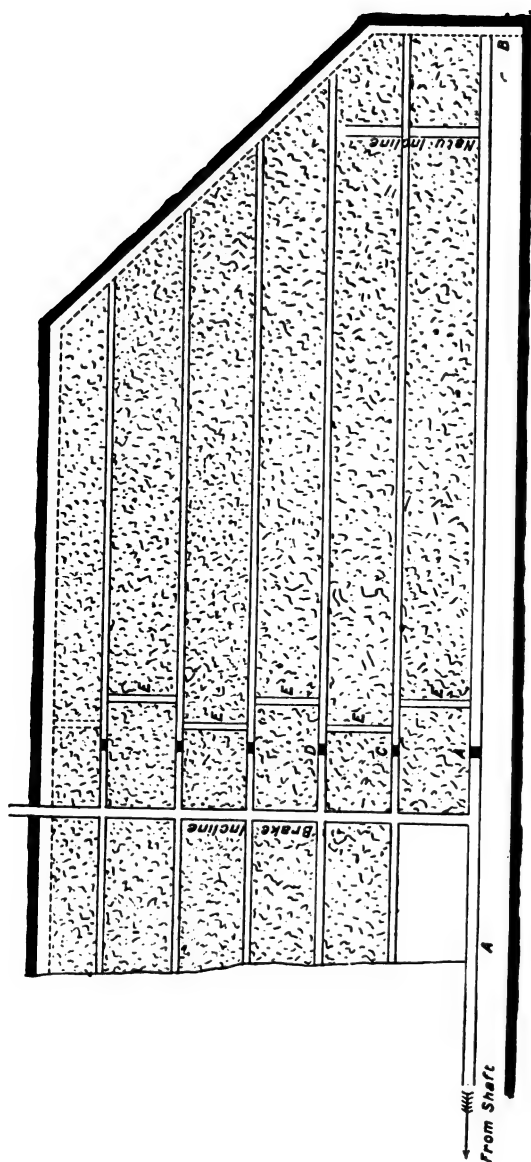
Plan of working at Niddrie when the seam is vertical.
